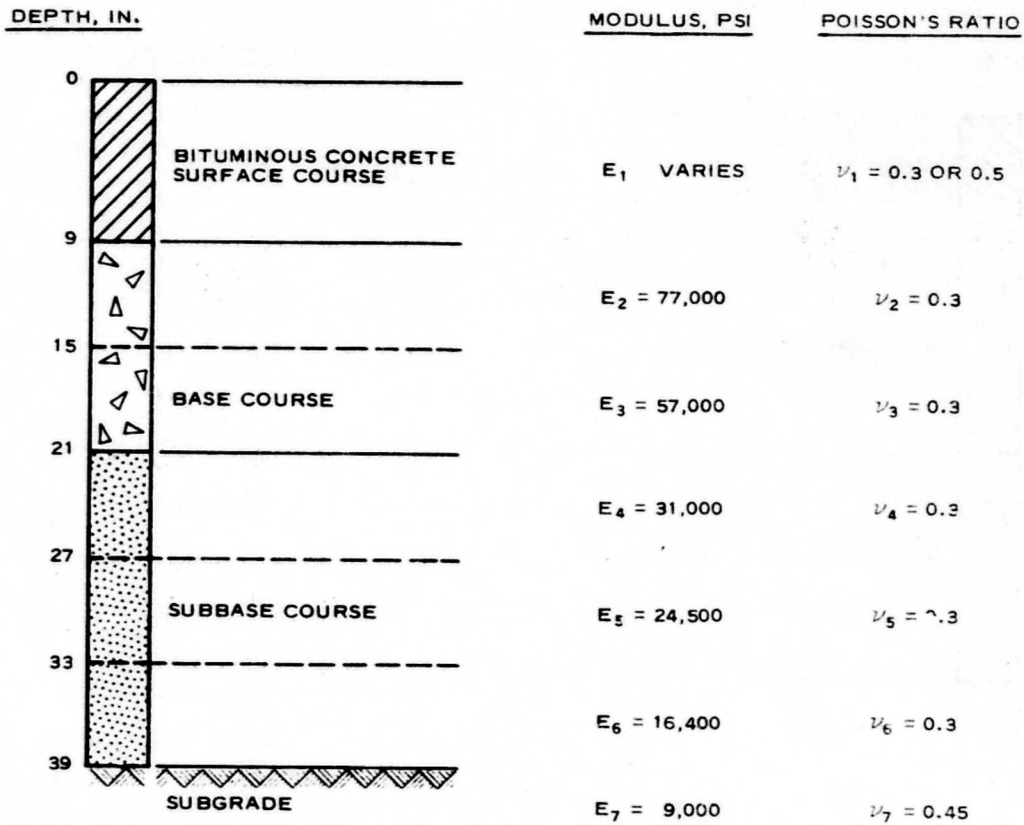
Estimated 39-in. conventional flexible pavement section with 9-in. bituminous concrete surface course
